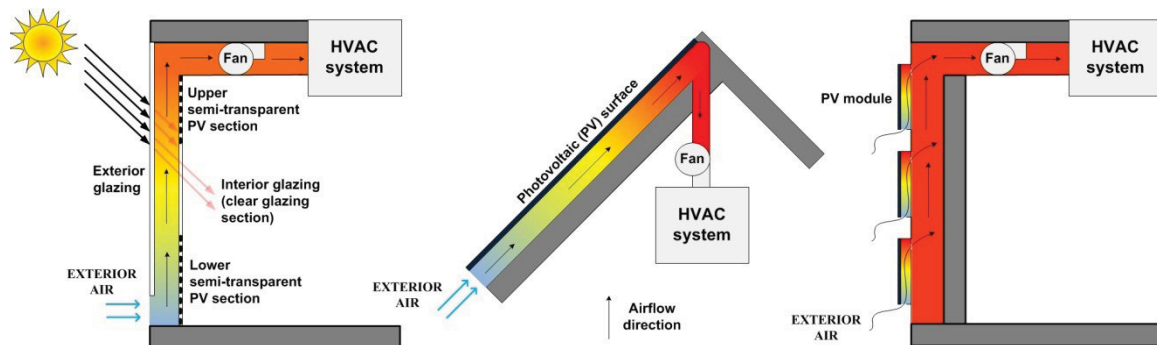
Schematic of three BIPV/T system configurations: semi-transparent BIPV/T façade system (left), single-inlet BIPV/T system for a roof (center), and multiple air inlet BIPV/T façade system (right).
